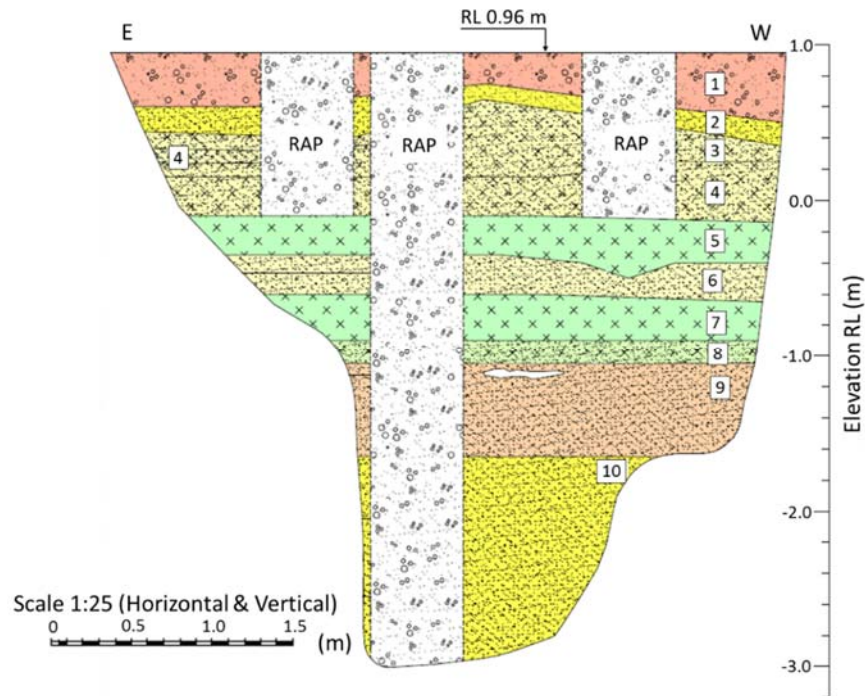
Cross-section of excavation trench at the 3-RAP-1 Test Panel. Modified from van Ballegooy et al. 2017.
